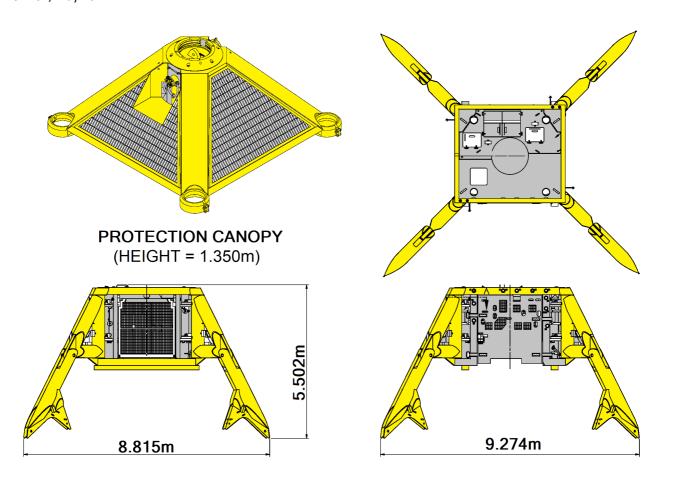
Elevation on WHPS for well P1 & W1 (protection cover not shown)
